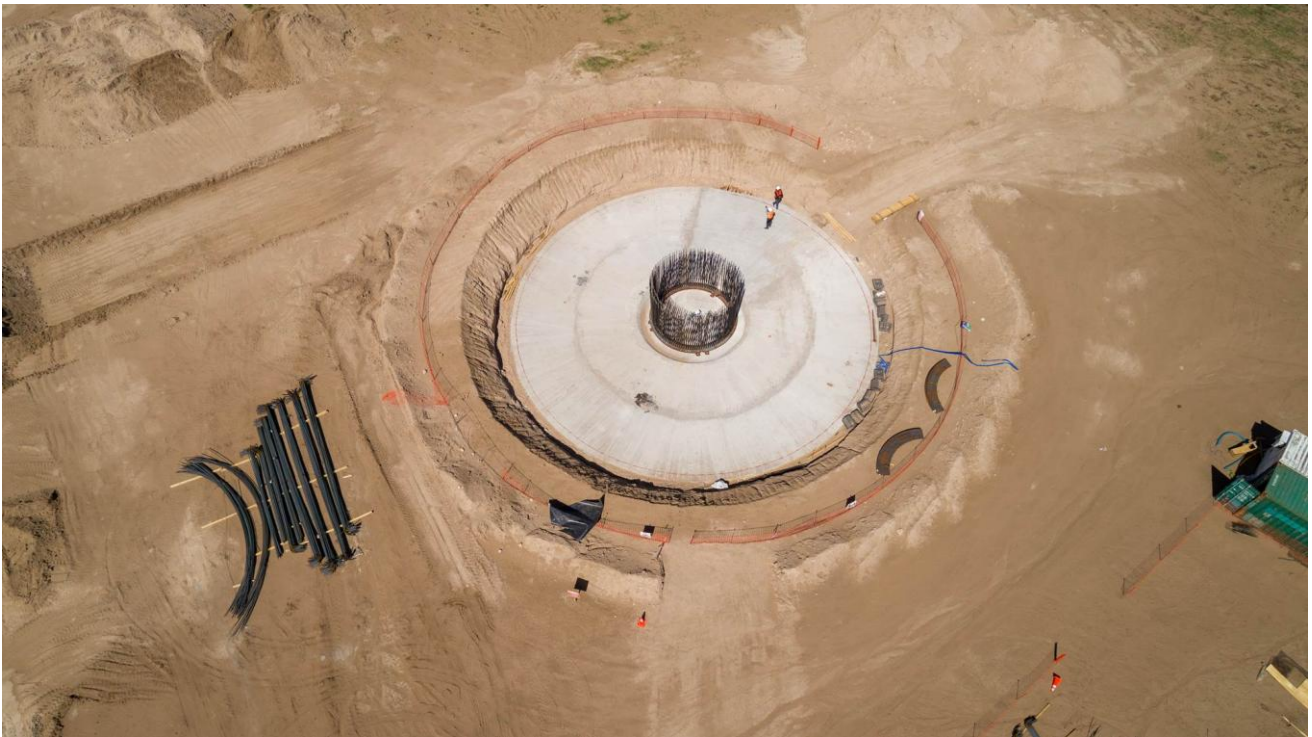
TYPICAL FOUNDATION BEING CONSTRUCTED
